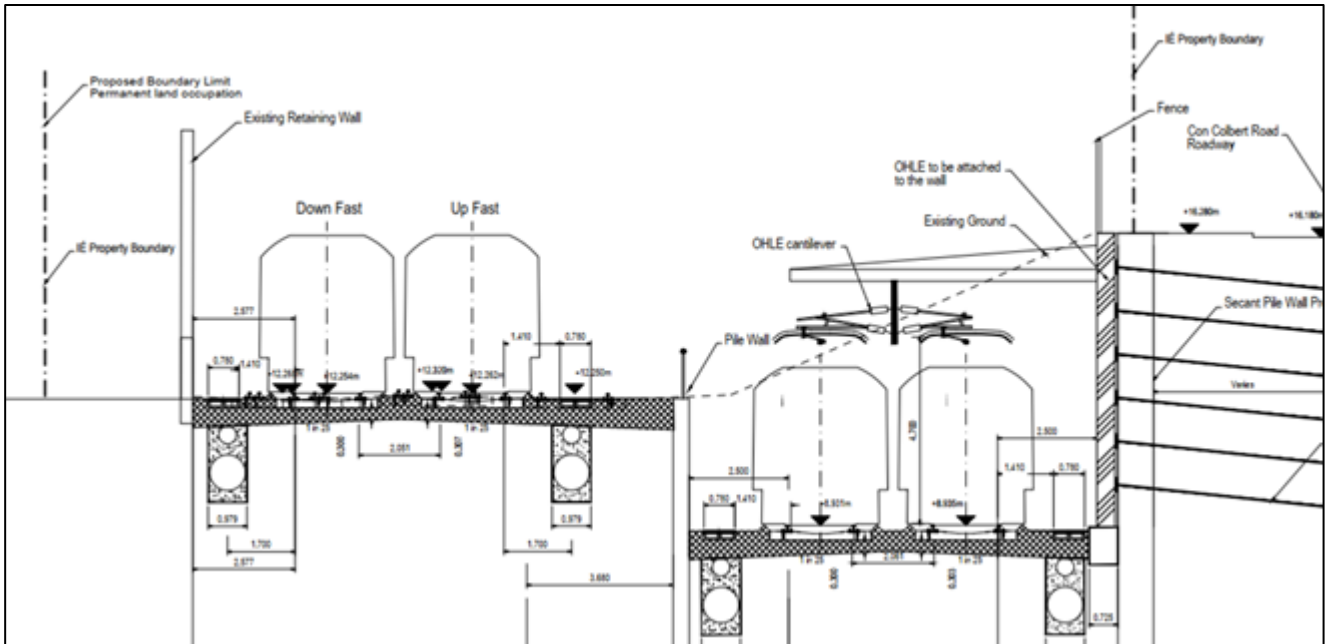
Con Colbert Road Retaining Wall & Ground Anchors
